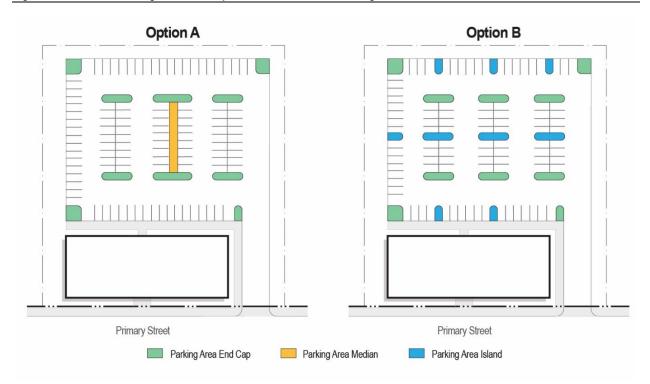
Off-Street Parking Area Landscape Standards in Front or Side of Building
